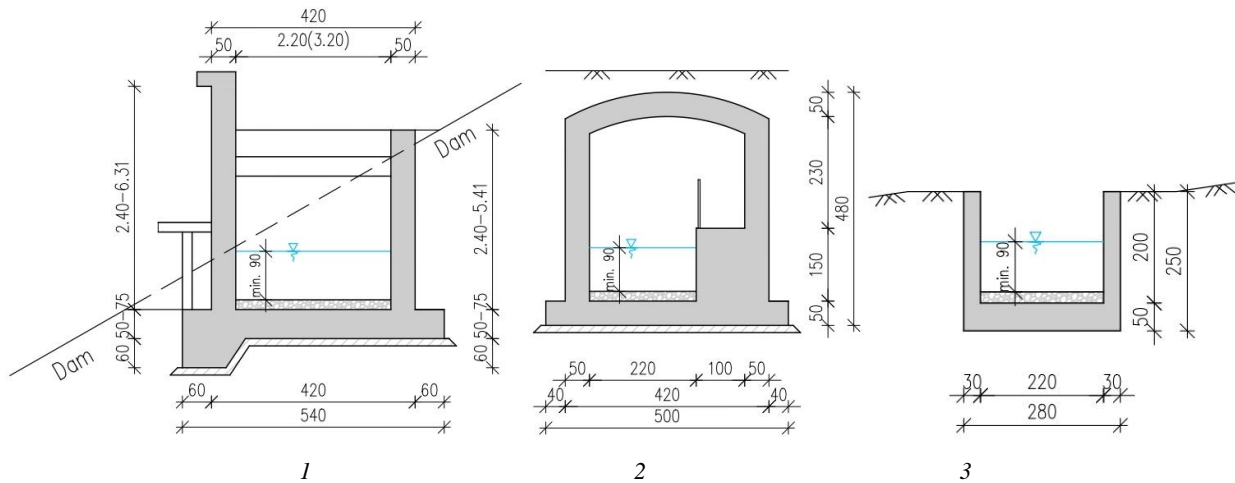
The fish pass cross-sections. 1 - fish entrance section; 2 - fish pass in the gallery crossing the dam; 3 - open section.
